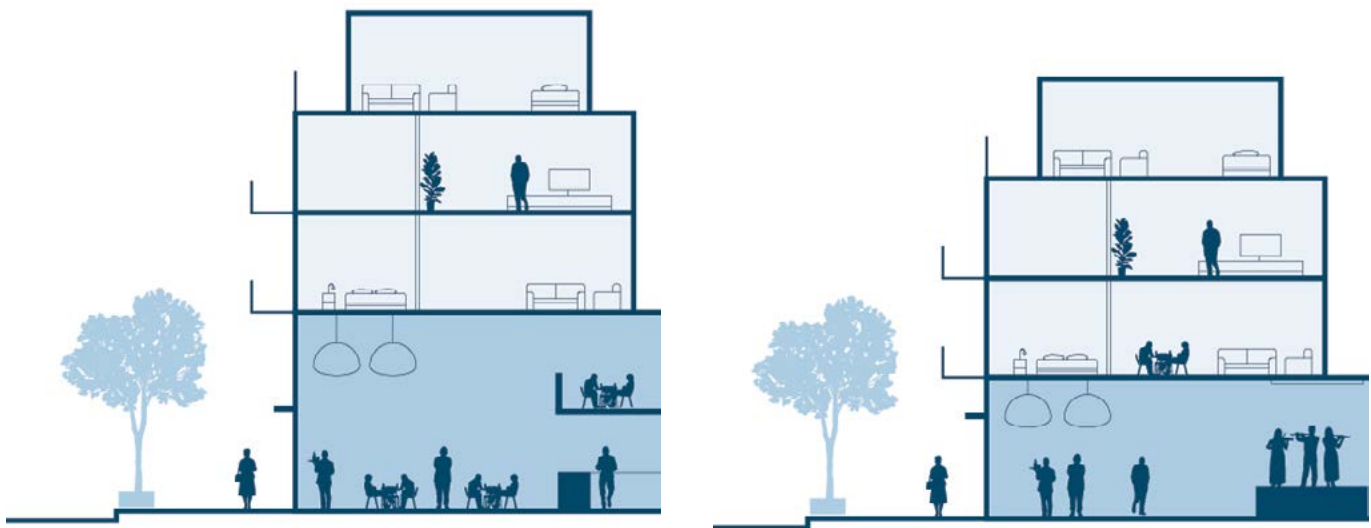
Design ground floor ceiling heights to be taller than typical floor levels to promote flexibility and adaptability of use.
